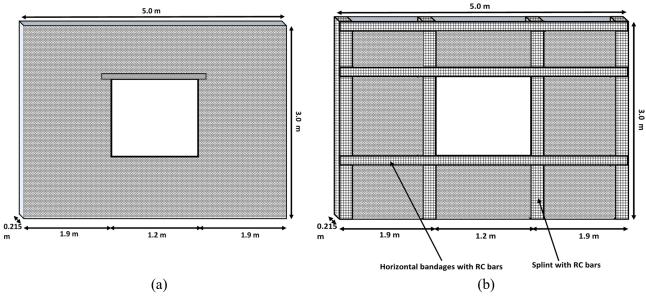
Schematic diagrams of the masonry wall: (a) unreinforced; (b) reinforced with splint and bandages.
